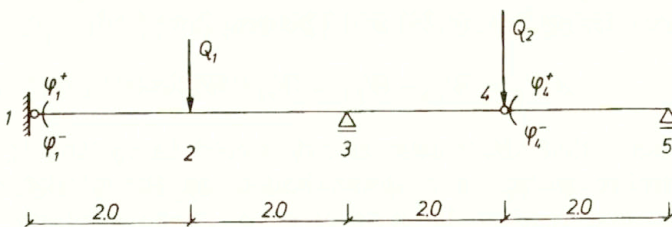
Beam layout, loads and rotation constraints at points 1 and 4.
